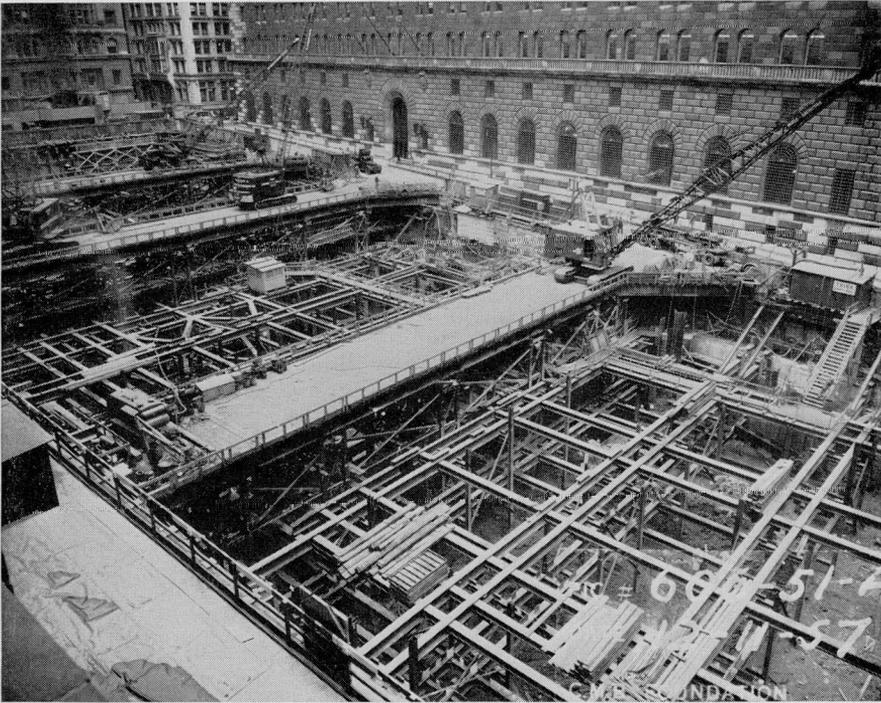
LOT JUST PRIOR TO PLACING THE 3RD BASEMENT STEEL. SHACK IN LEFT CENTER IS CONTROL STATION FOR JACKING OPERATION. NOTE TRUCK AND CRAWLER CRANES ON ACCESS TRESTLES.
